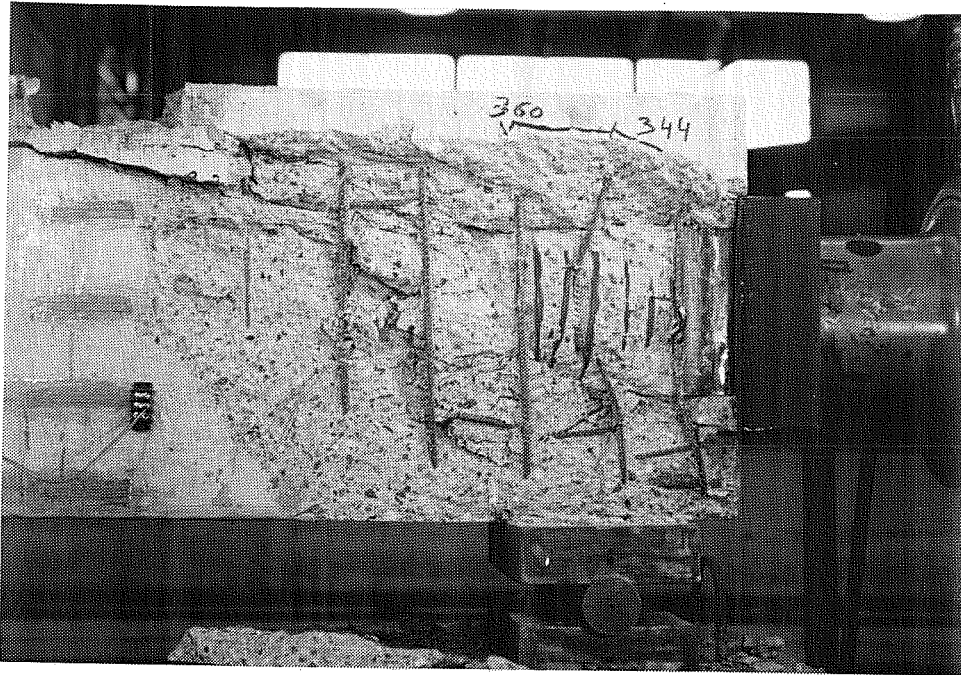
Concrete Plug Punched into Beam (Specimen Beam3)
